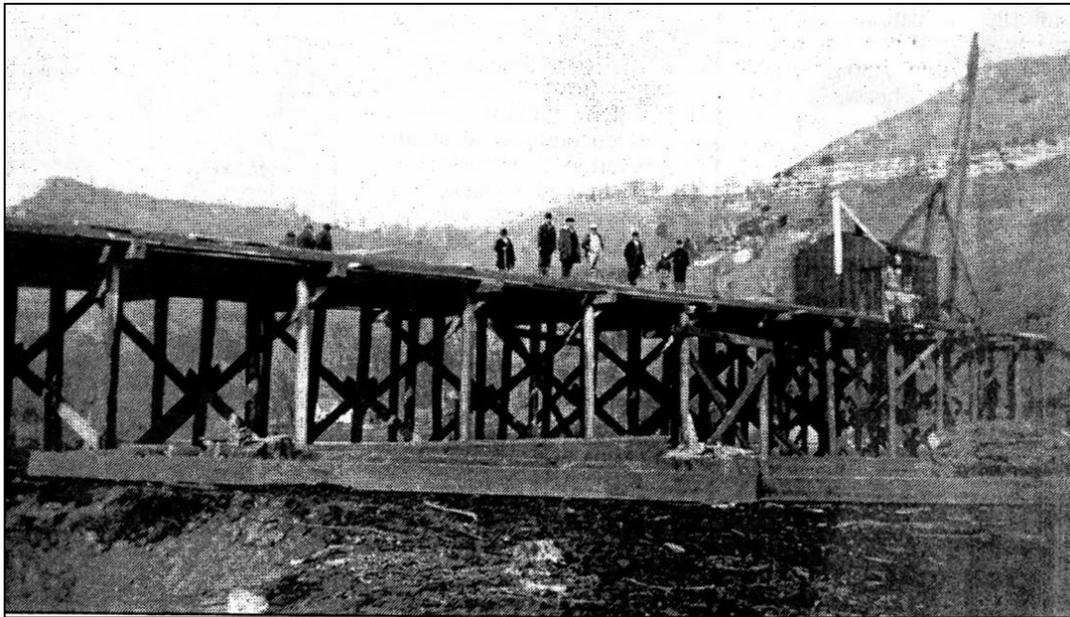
Construction of original Winneshiek Slough Bridge, looking north.
